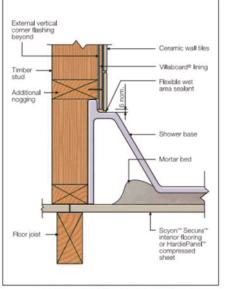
PREFORMED TRAY DETAIL FOR VILLABOARD LINING
